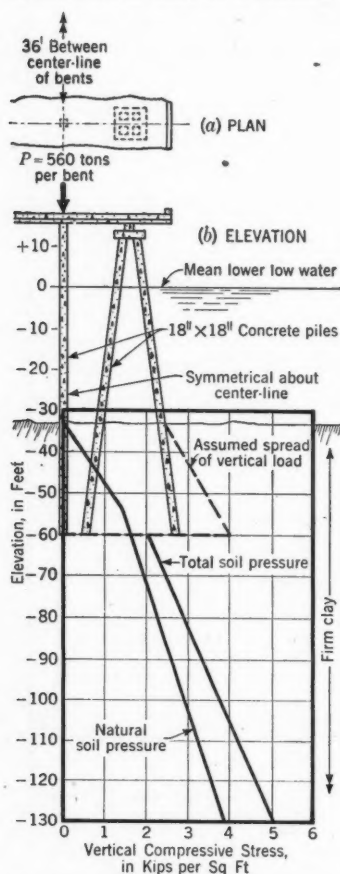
SOIL PRESSURES UNDER PRE-CAST CONCRETE PILE FOUNDATION AT SHIPYARD SITE
